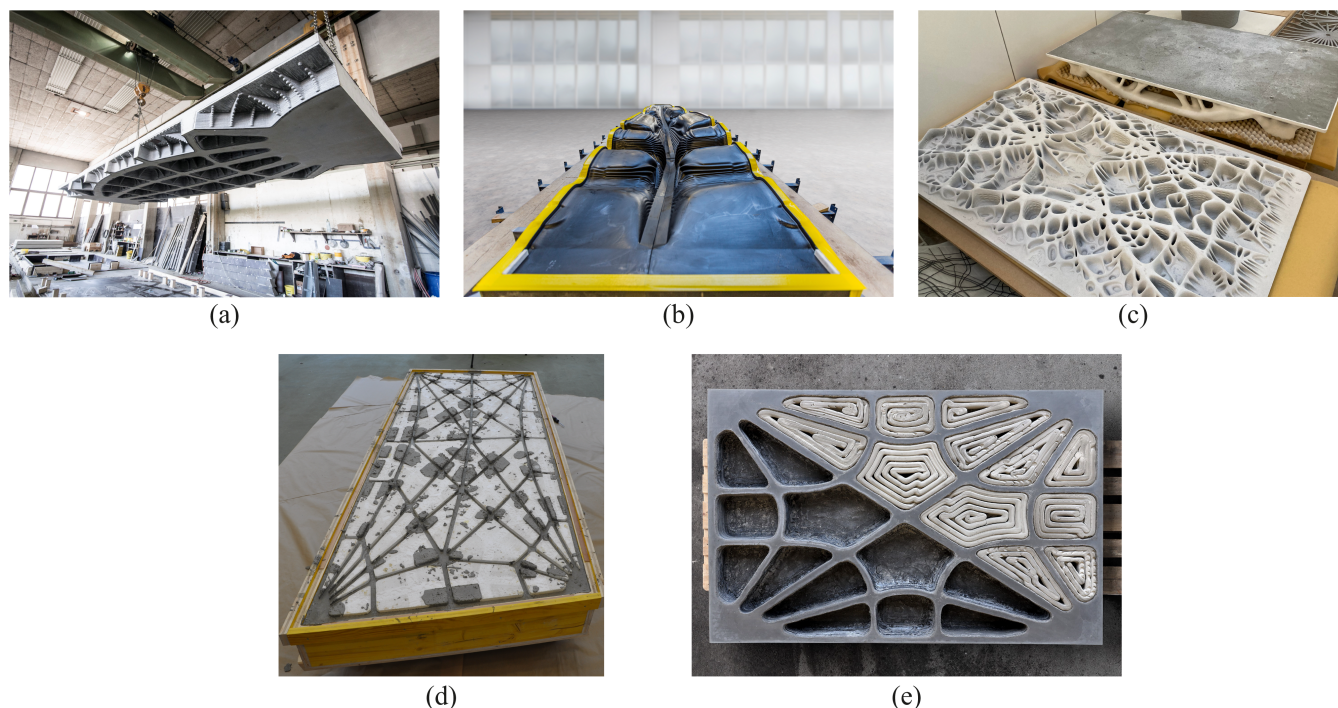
Examples of slabs built with automated formwork: (a) 3D-extrusion printing of concrete²⁴ © Robert Schmid; (b) binder jetted polyester formwork¹⁷ © Andrei Jipa; (c) binder jetted sandstone formwork²²; (d) funicular floor slab with CNC-milled polystyrene inlays¹⁸ © Andrew Liew; and (e) ribbed slab with printed mineral foam inlays²¹ © Patrick Bedarf.
